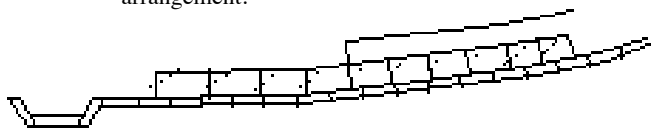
Ko Si Chang 2 cross section showing nailing arrangement.
